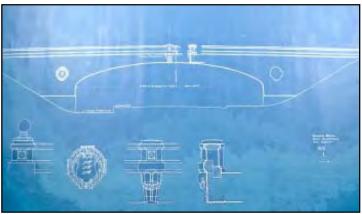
Elevation of Bloomfield Avenue Bridge, by Walter Cook, Plan #2121-640, 21 March 1904. Source : ONHS.
